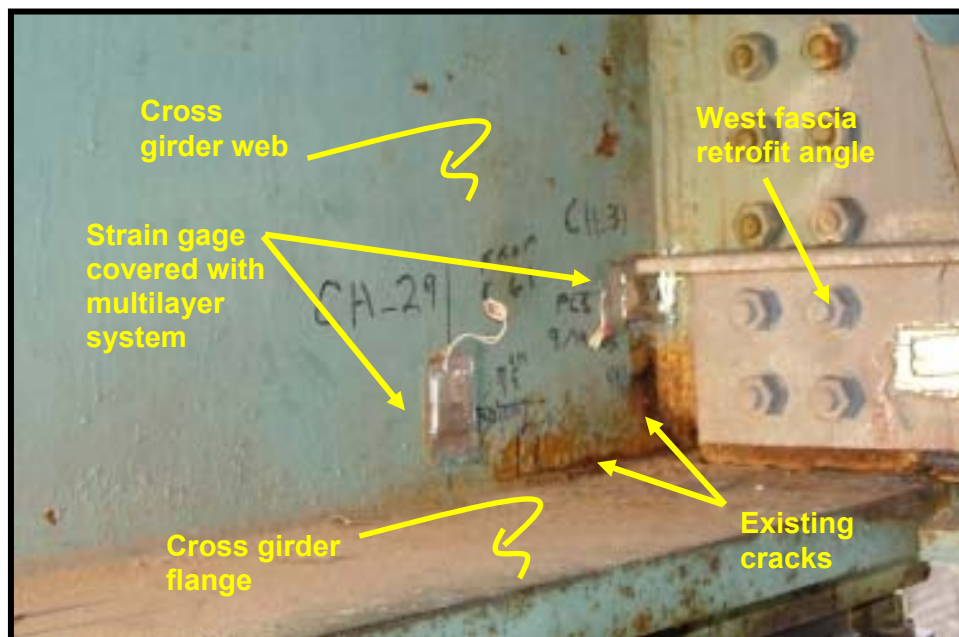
Strain gages CH_29 and CH_30 installed on the north face of the cross girder web near the existing cracks
